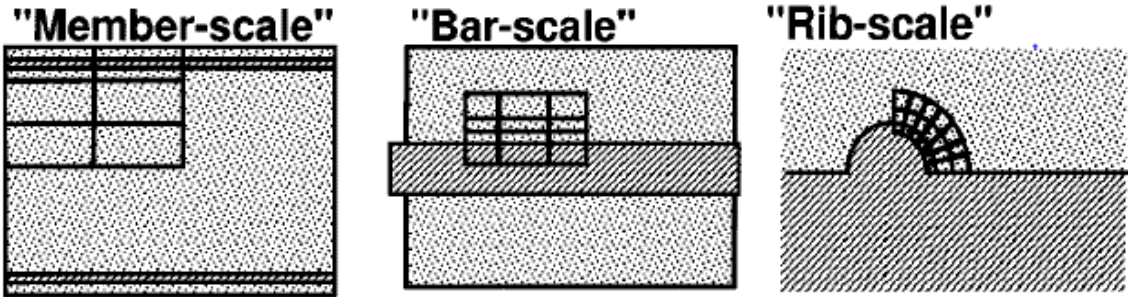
Scales used to study of bond between reinforcing bars and concrete [64]
